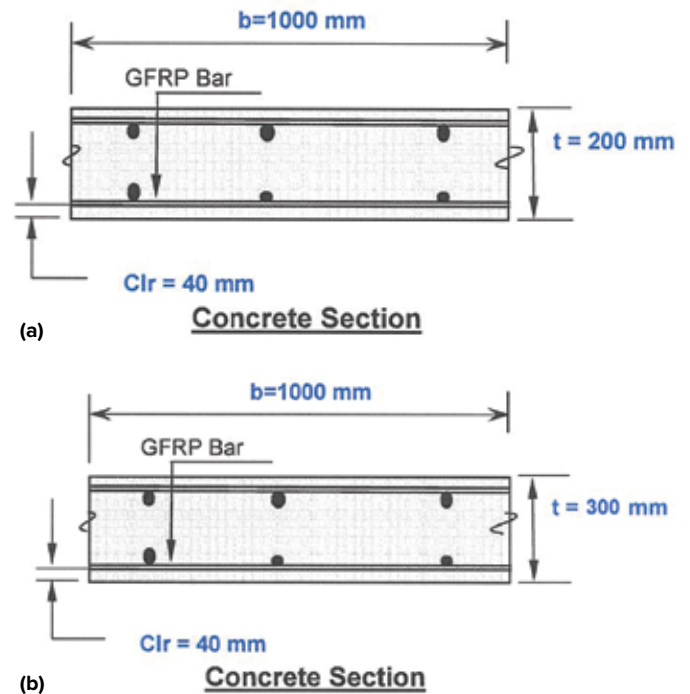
Cross sections: (a) bridge deck; and (b) approach slab (from Reference 10)
